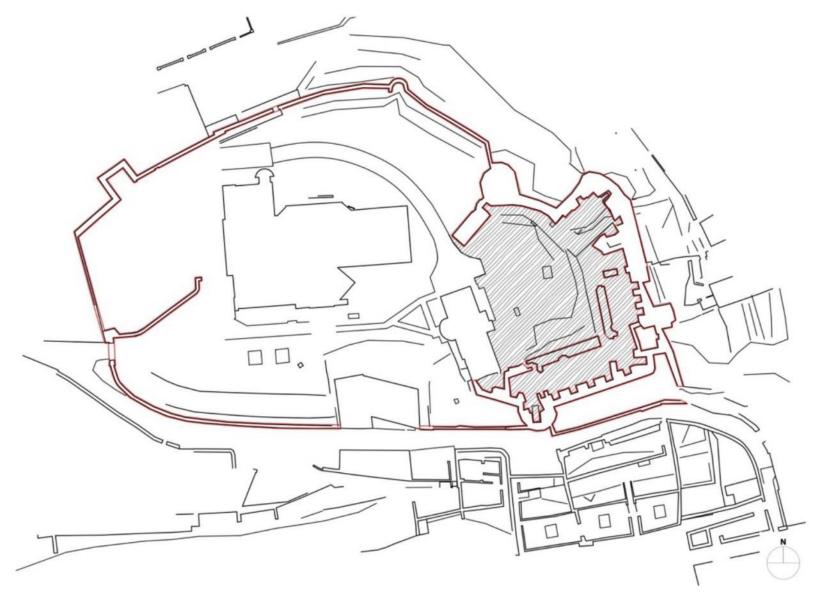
Detailed plan of survey area (shaded) within Haverfordwest Castle, plan provided by the client.
